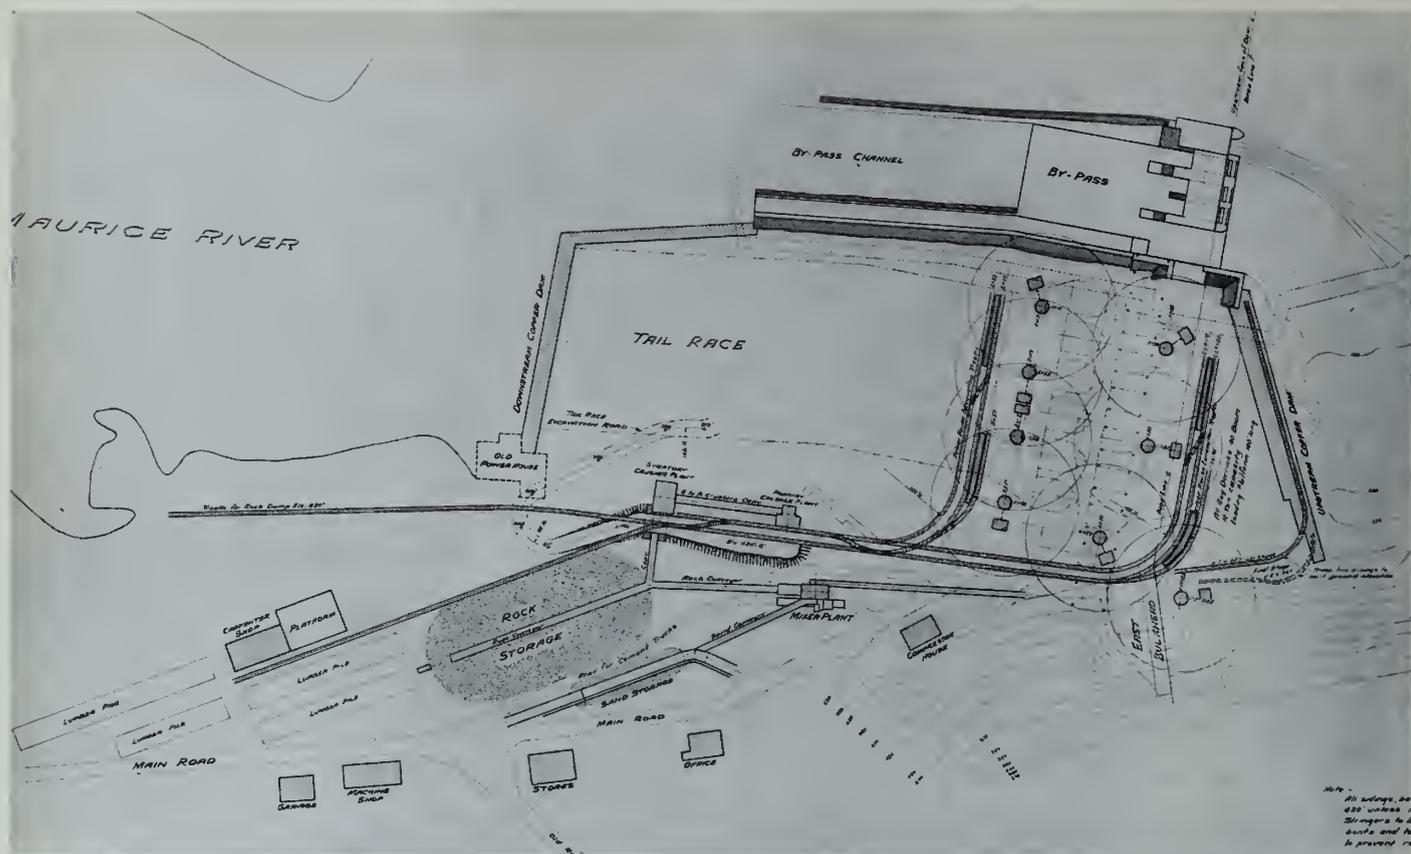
Plan showing layout of construction plant for excavation of power house and tailrace.
